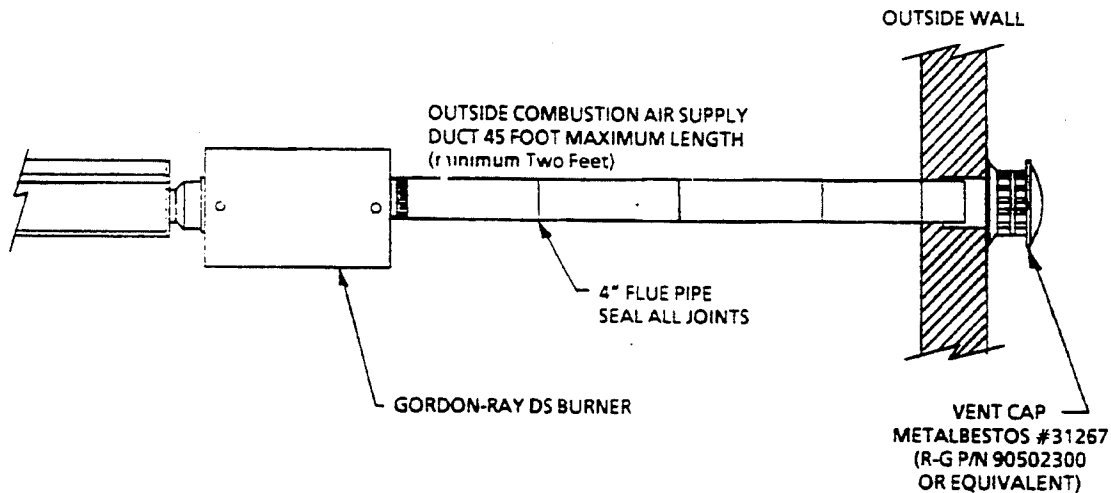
OUTSIDE COMBUSTION AIR INSTALLATION
